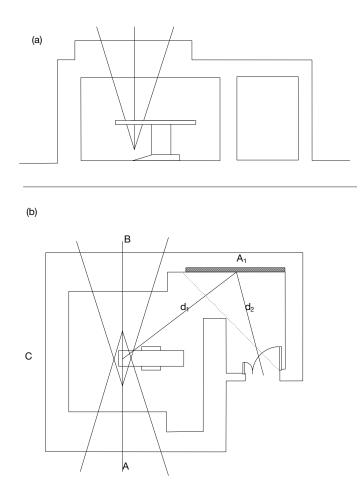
Schematic layout of a ⁶⁰Co room showing (a) elevation and (b) plan.
